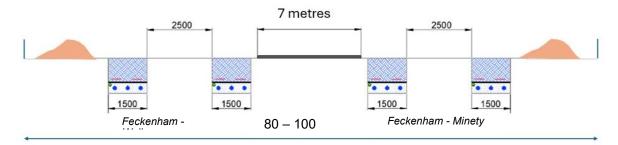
Illustration of a typical construction swathe (measurement are subject to detailed design)
